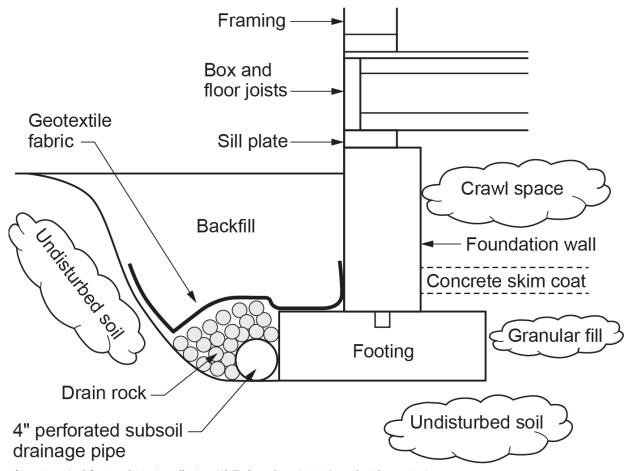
Typical footing drain installation. (Skilled Trades BC, 2021) Used with permission.
